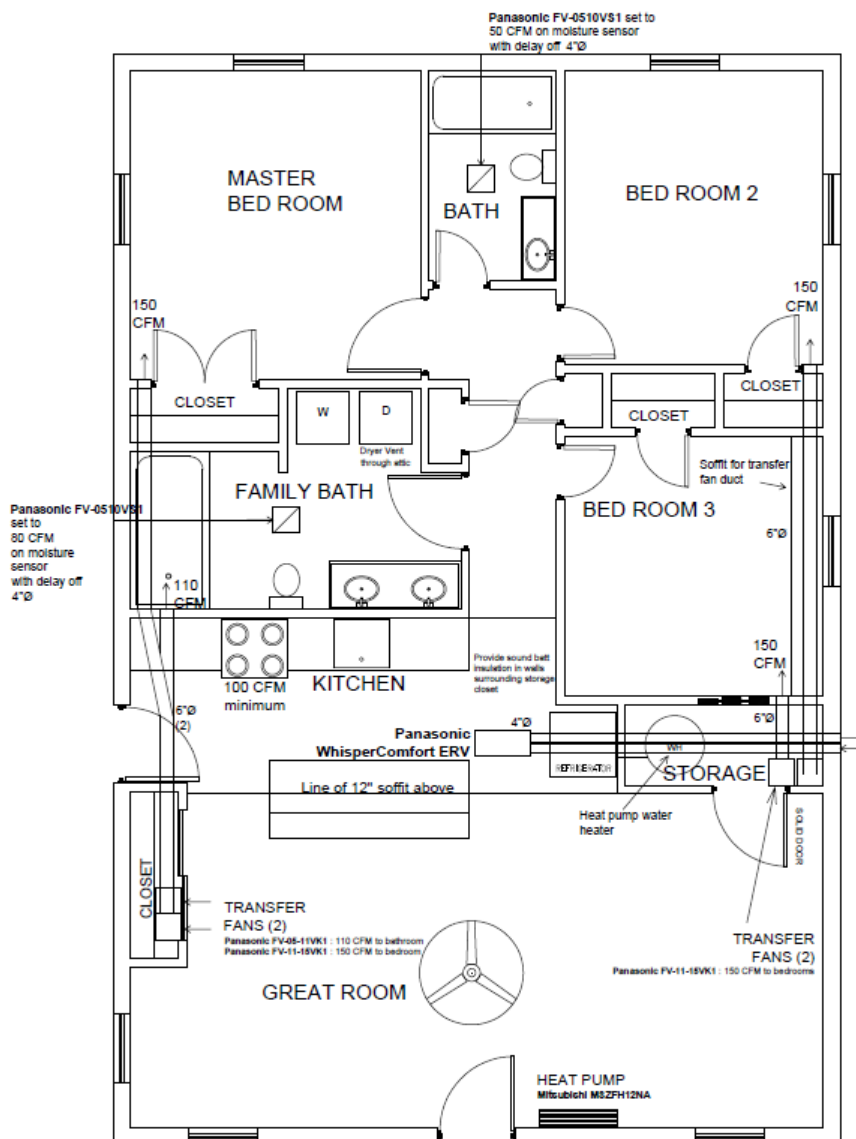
Massachusetts home floor plan (28 ft x 41 ft overall)
